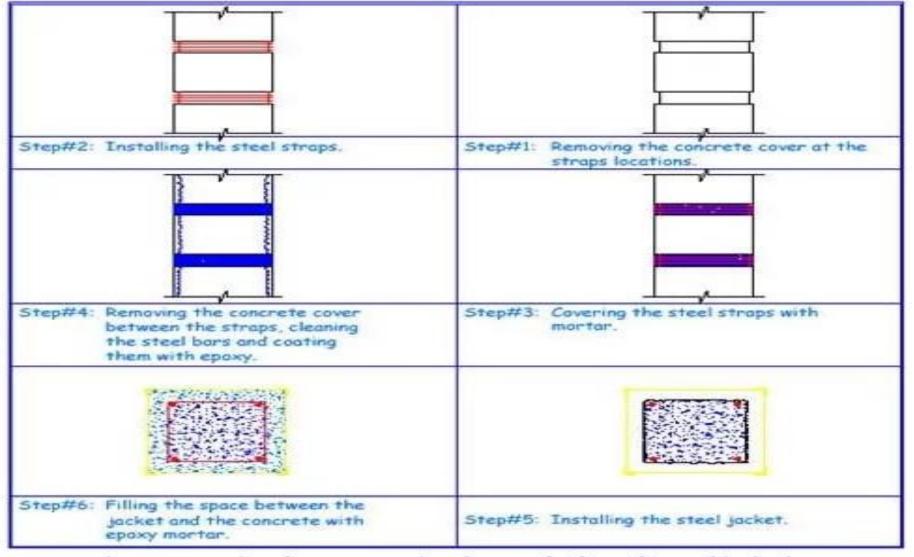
Increasing the cross-sectional area of column by steel jacketing
